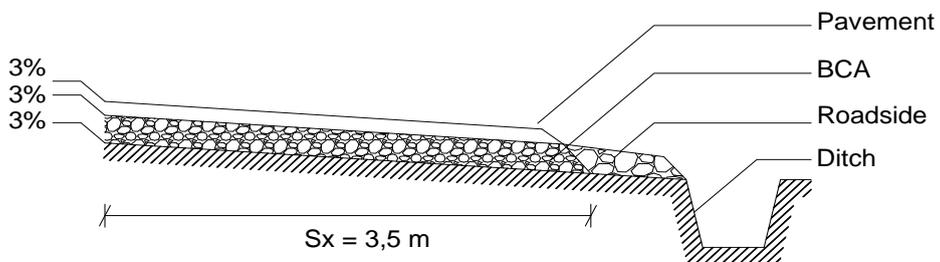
Cross section of Road Class 1 with 3% subgrade slope
